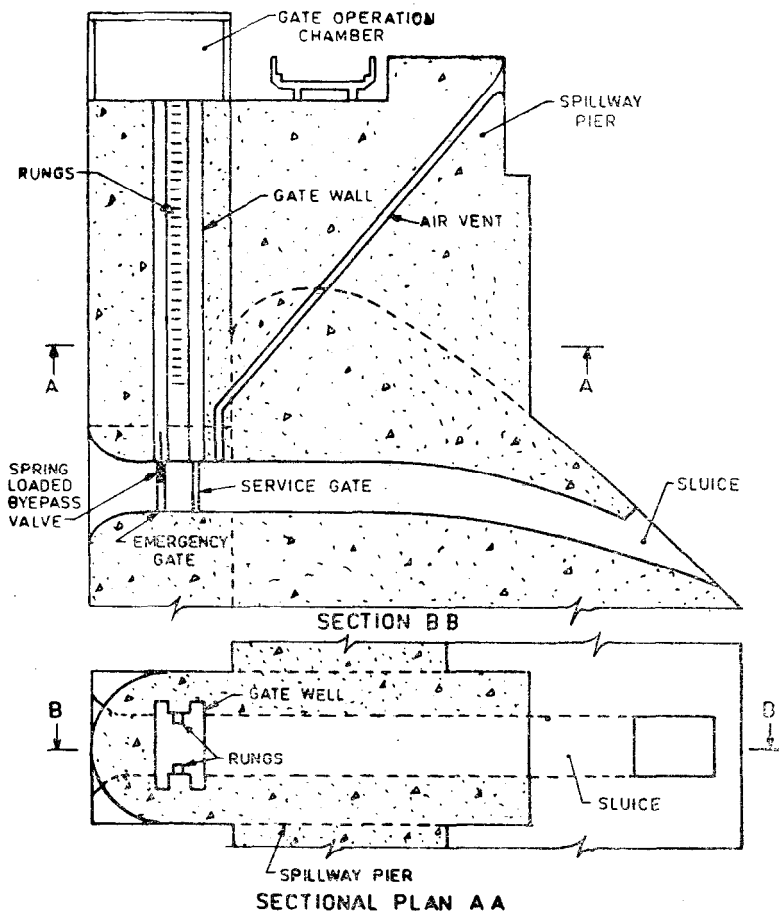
TYPICAL DETAILS OF SLUICE LOCATED IN THICK SPILLWAY PIER
